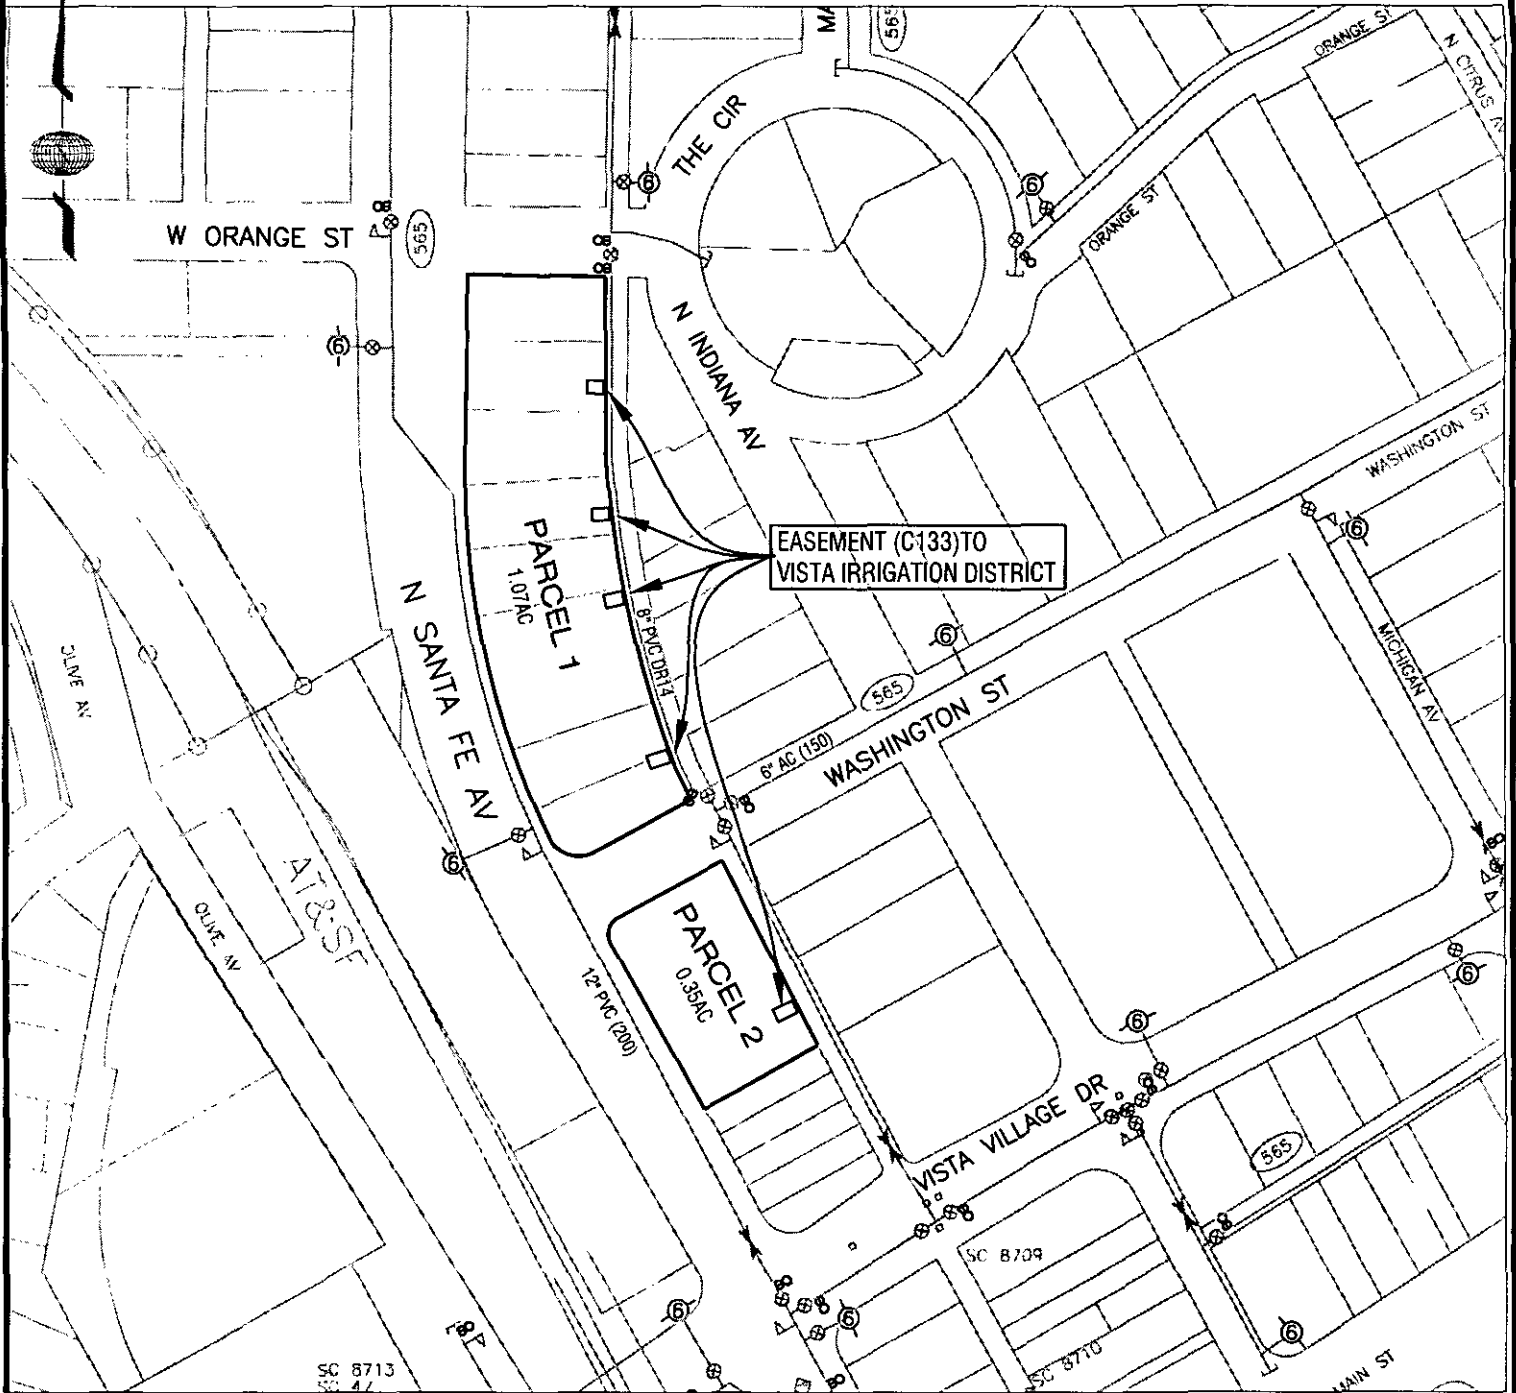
DETAILED REPORT: The North Santa Fe Housing Project is a 67 unit affordable housing project located on the east side of North Santa Fe Avenue, midway between Vista Village Drive and Washington Street – north to Orange Street (across North Santa Fe from the Vista Transit Center).
